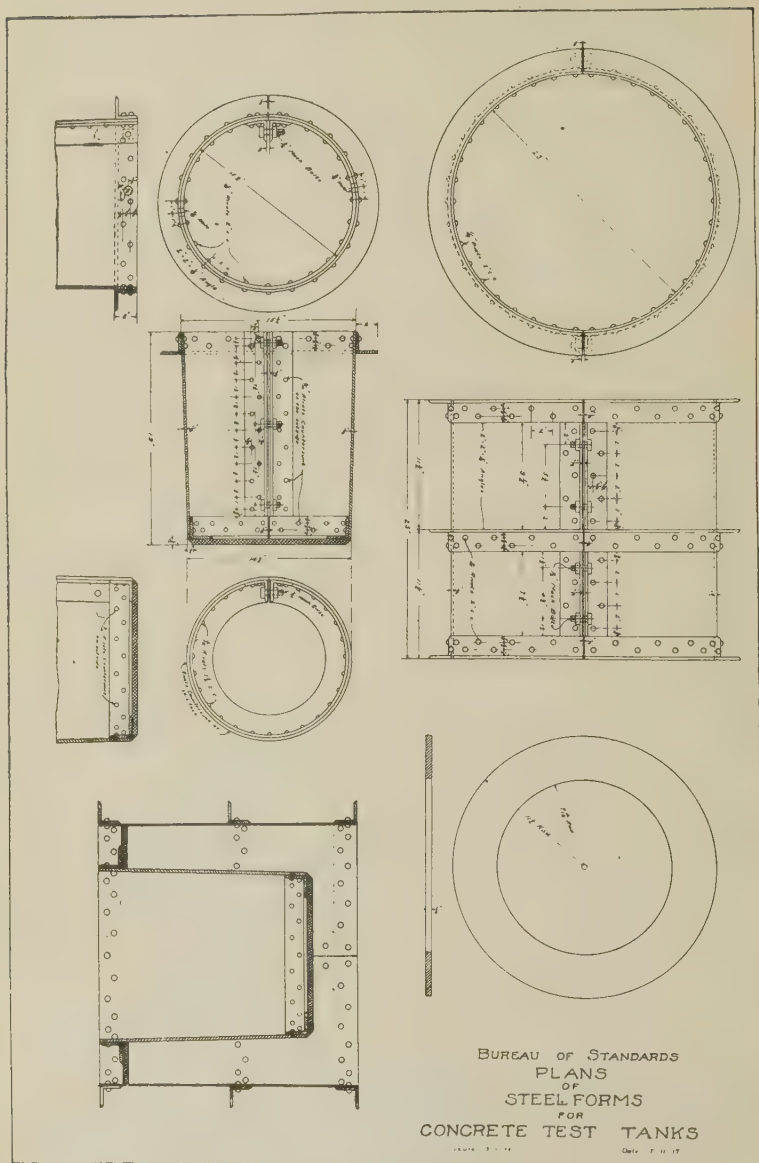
DETAILS OF STEEL FORMS FOR CONCRETE TEST TANK.
